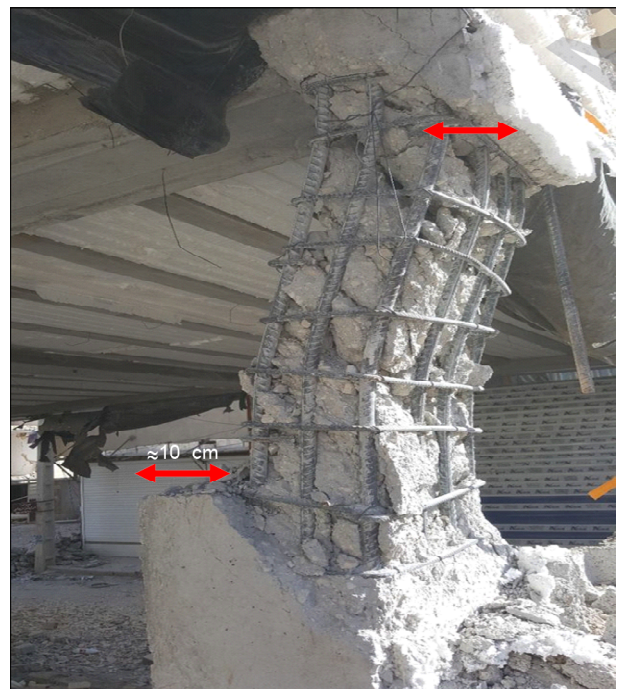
The overly sized concrete cover in columns of a collapsed building in Sarpol-e Zahab 2017 earthquake.
